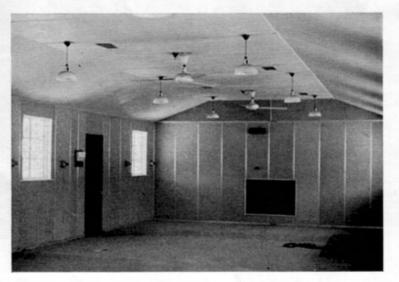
Salerno Camp. Completed hut with false ceiling showing fans and lamp fittings and air-conditioning grills.
